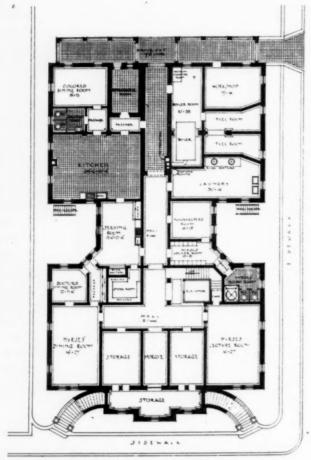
Baker Sanatorium, Charleston, S. C. Basement plan.
